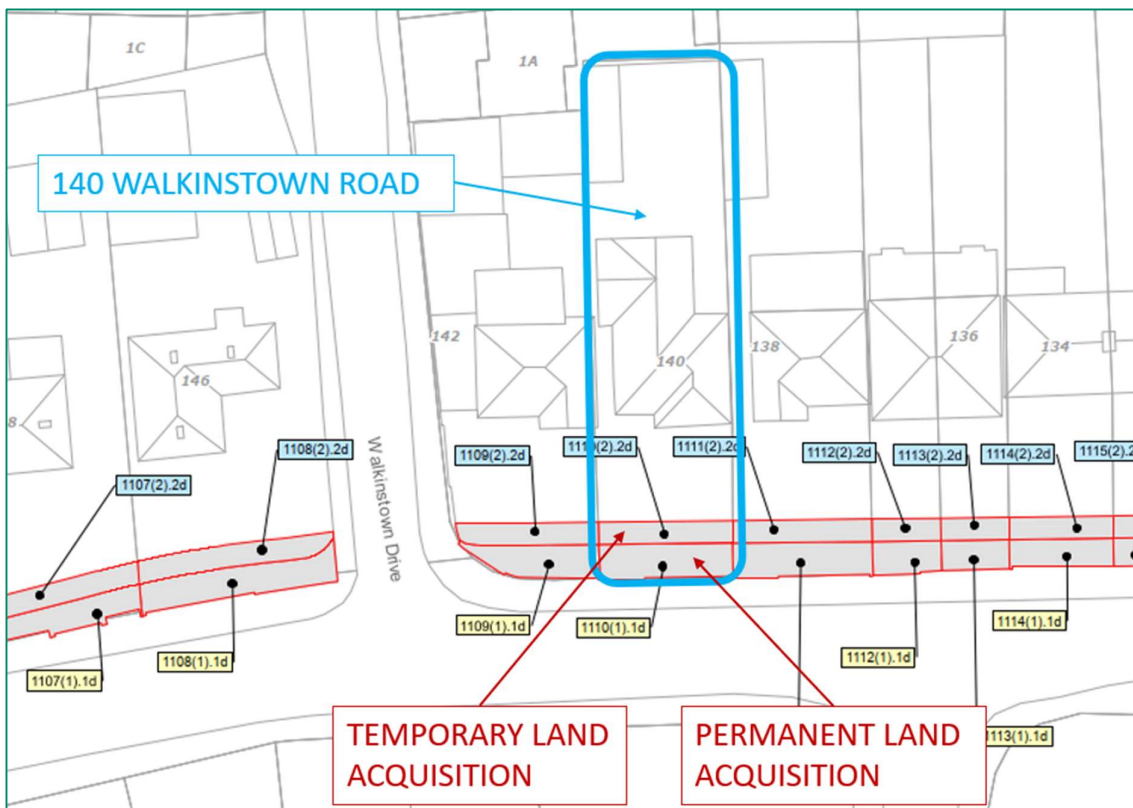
Extract from CPO Deposit Maps adjacent to 140 Walkinstown Road
